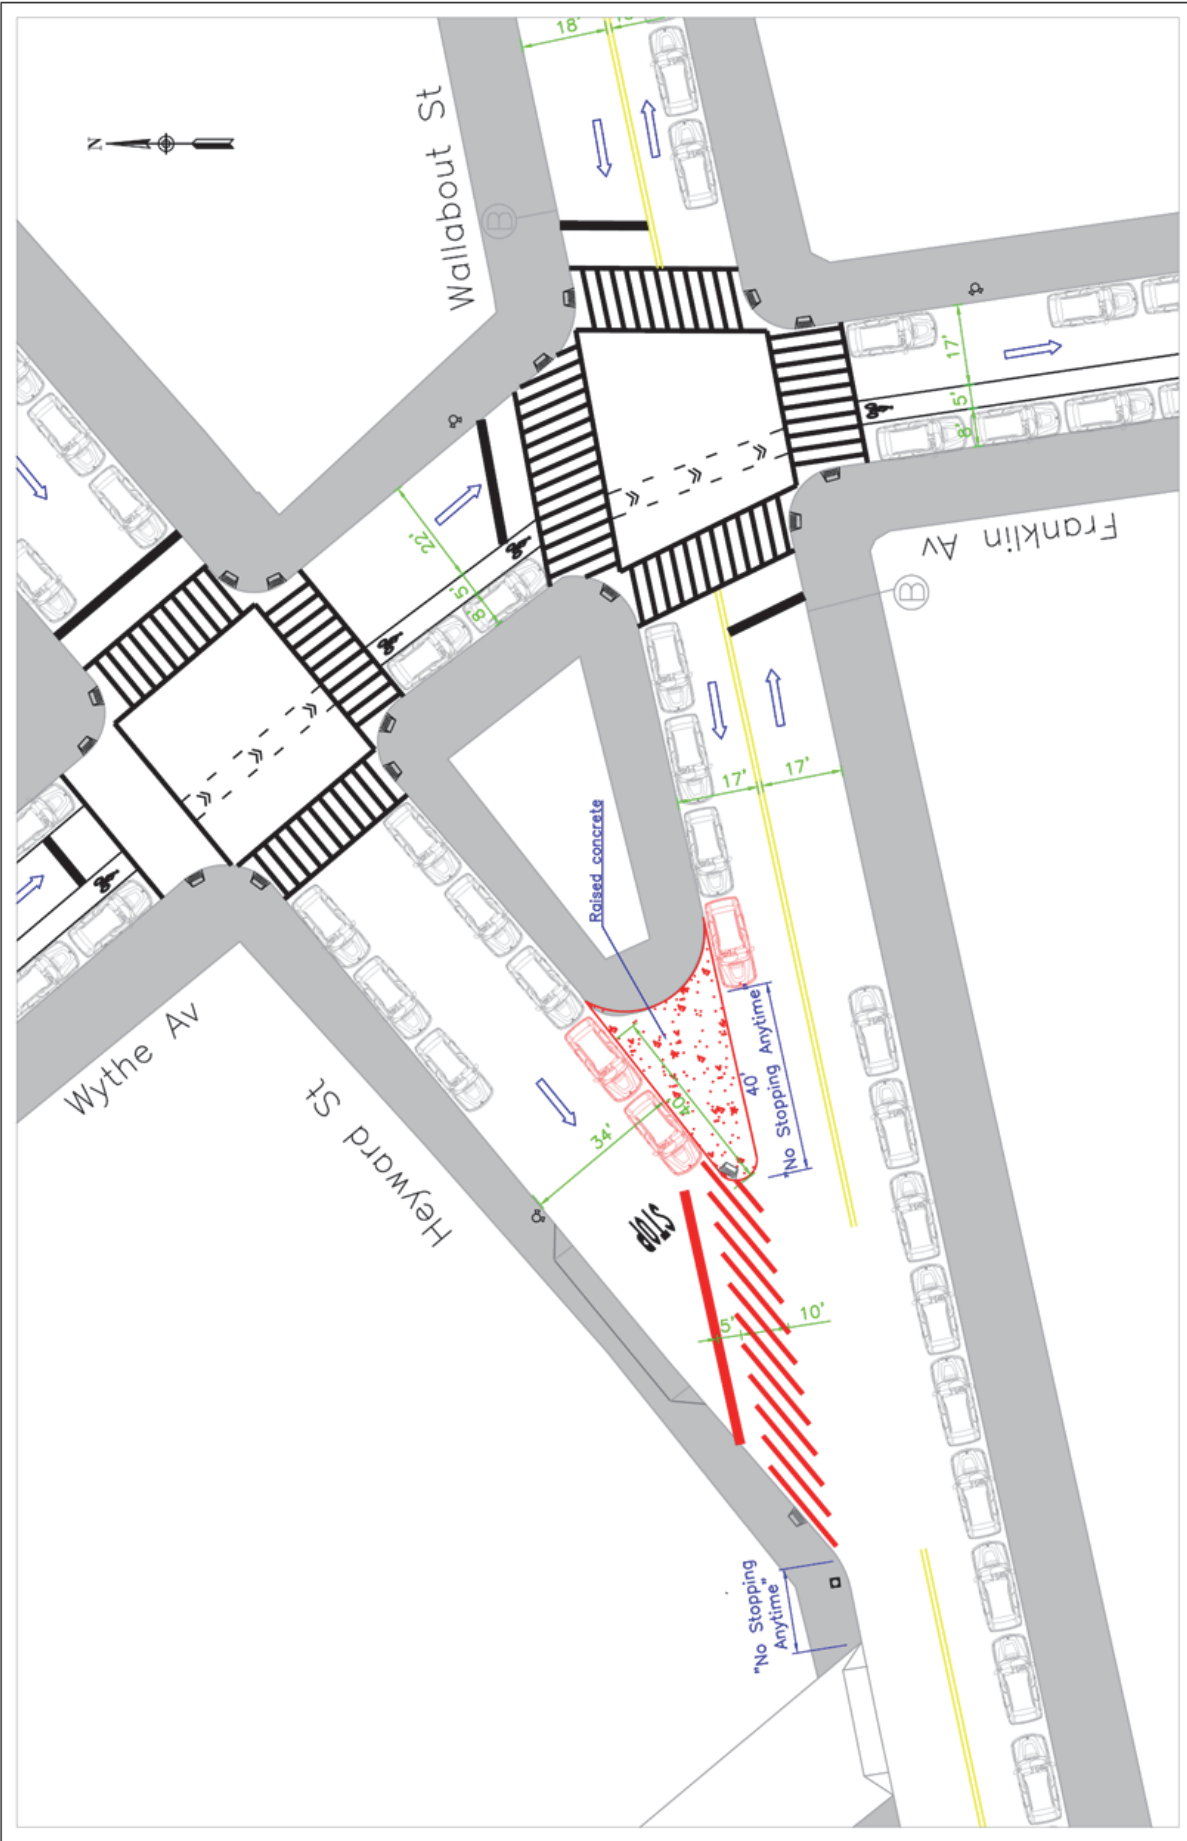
Wallabout Street and Heyward Street - Proposed
